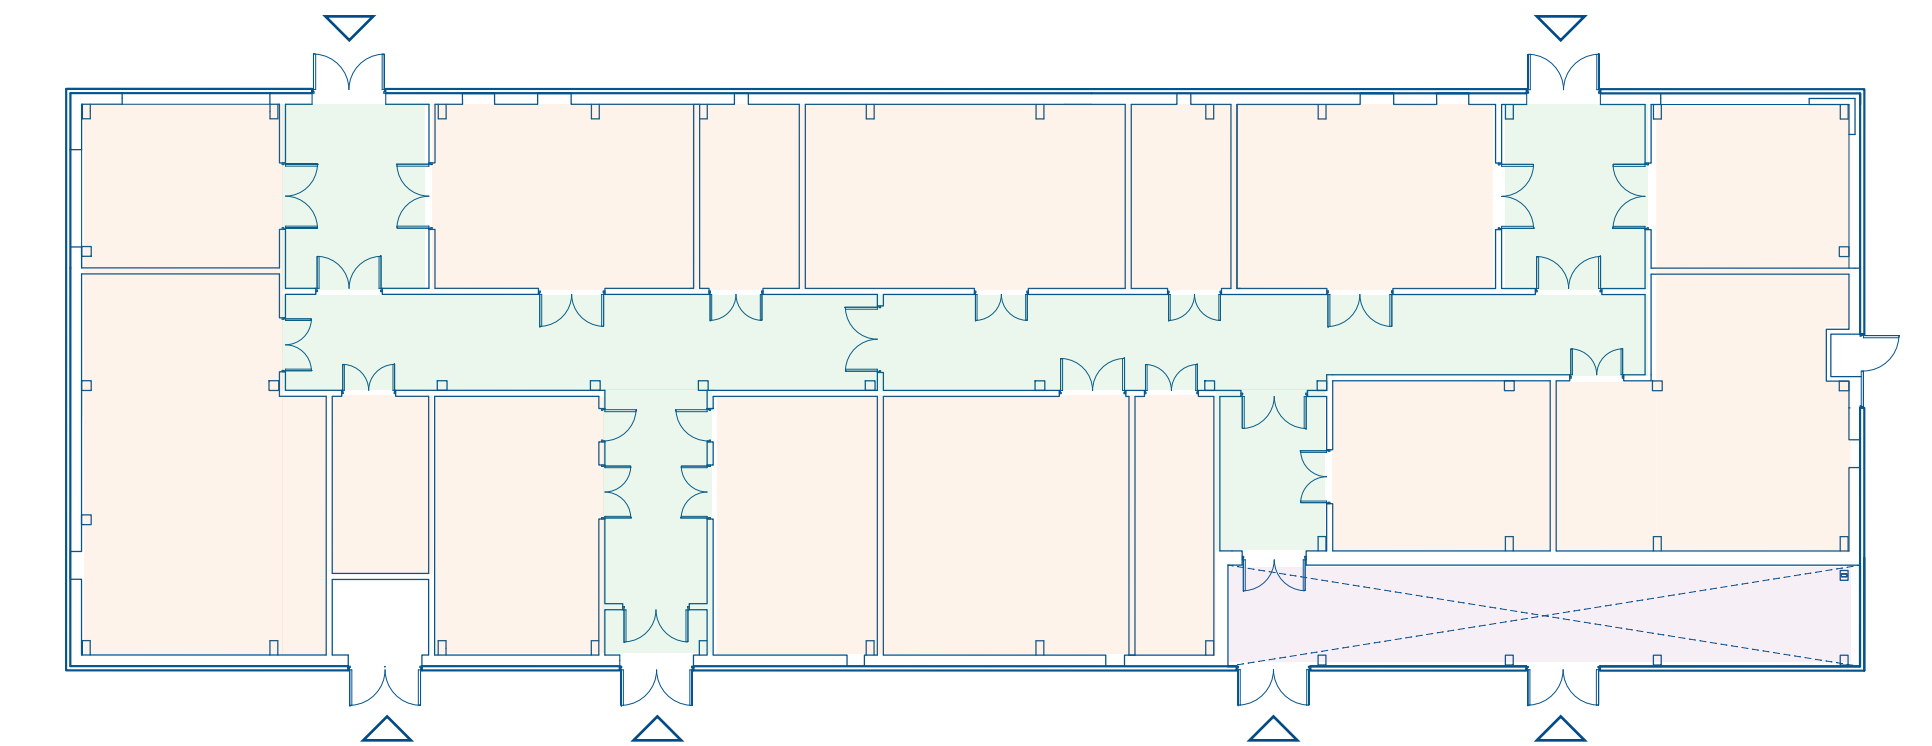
\_ Proposed plan - Compound building internal arrangement
